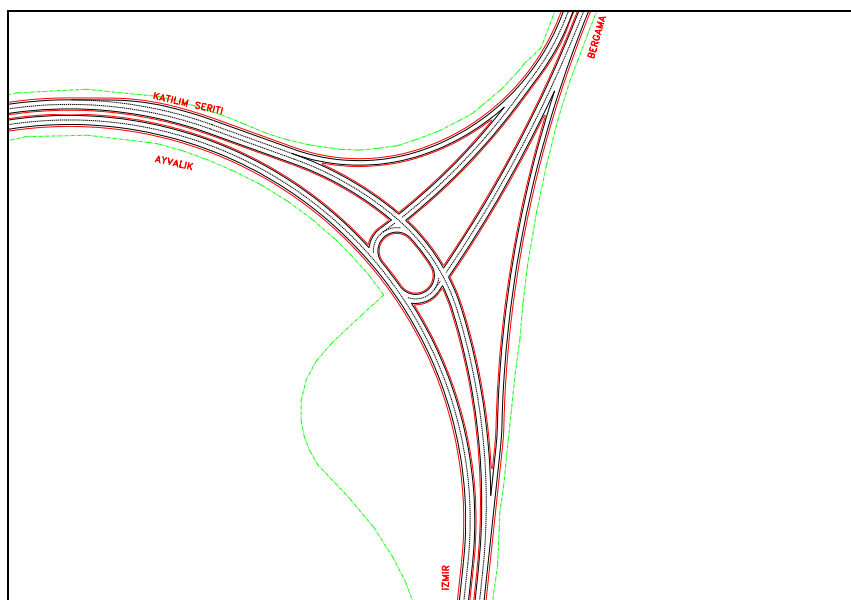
Proposed solution, two lanes weaving section, one lane on bypass (alternative 1)
